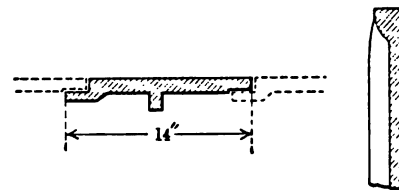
EWARTS' MODIFIED SHEET-PILING.
